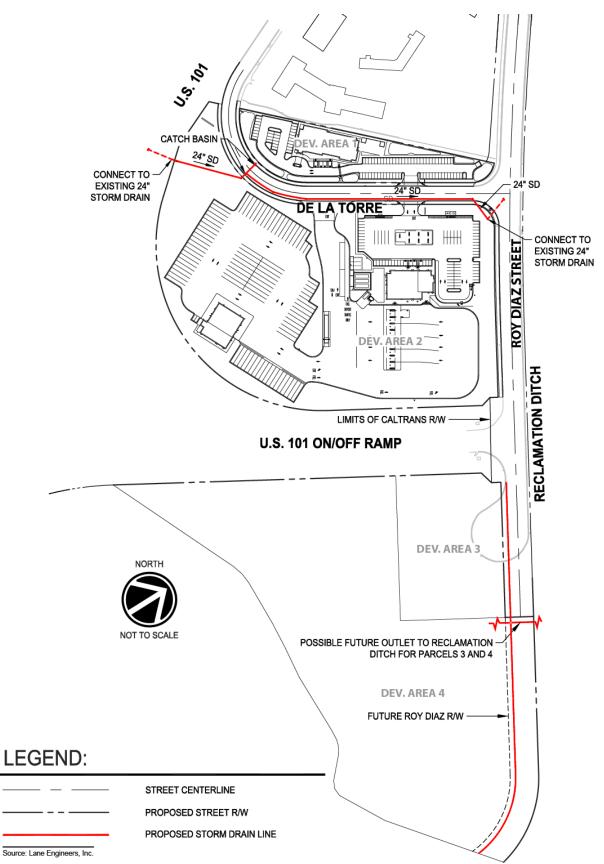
Specific Plan Area Treated Overflow Storm Drain System Map
